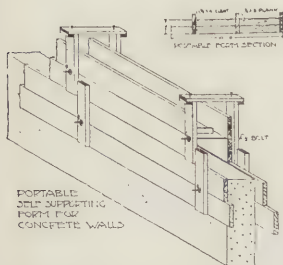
Form for carrying wall up with use of least possible lumber.
